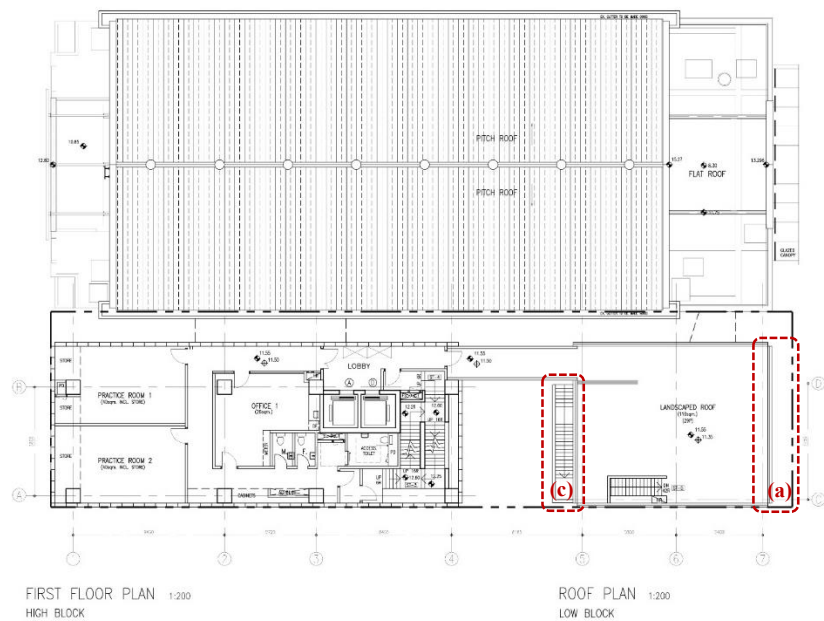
Figure II. Proposed Roof Plan (Low Block) - (a) the frontage of the proposed low block is set back by approximately 1.1 m; (c) the internal staircases are replaced with an external open staircase leading to landscape roof for better appreciation of the east elevation of YMTT.
